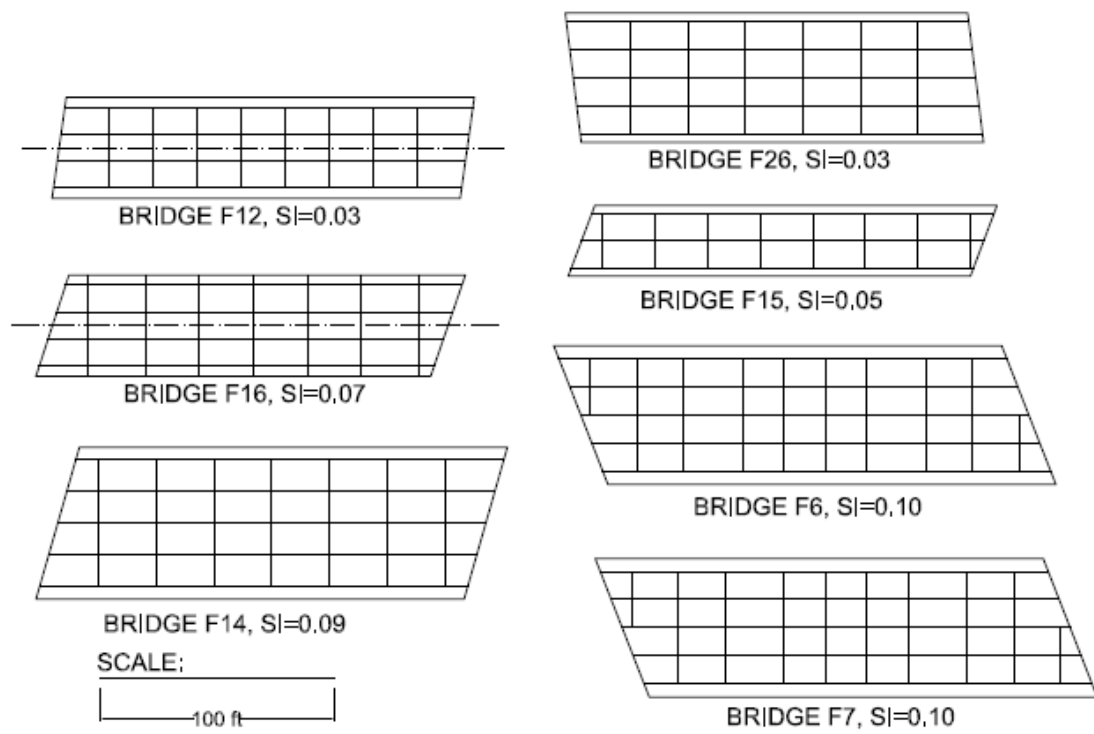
Other simple-span bridges with contiguous cross-frame arrangement.
